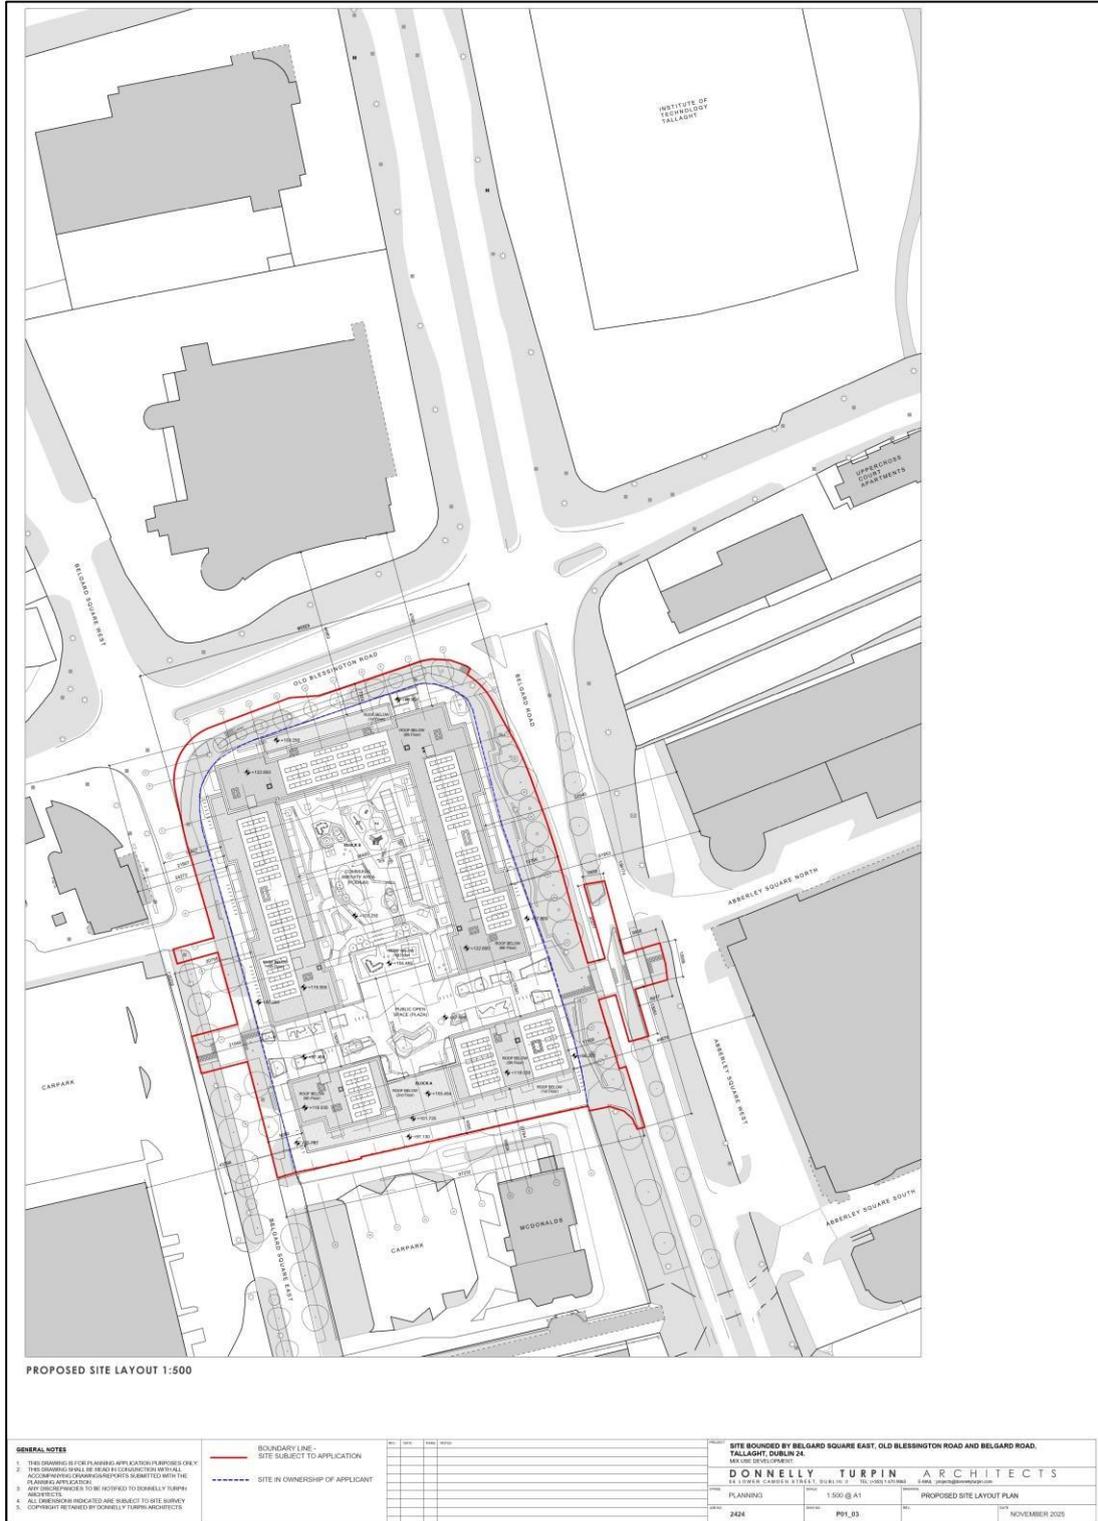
Proposed Site Layout for development at Site Boundary of Belgard Square East, Old Blessington Road and Belgard Road, Tallaght, Dublin 24 [Source: Donnelly Turpin Architects] (Not to Scale)
